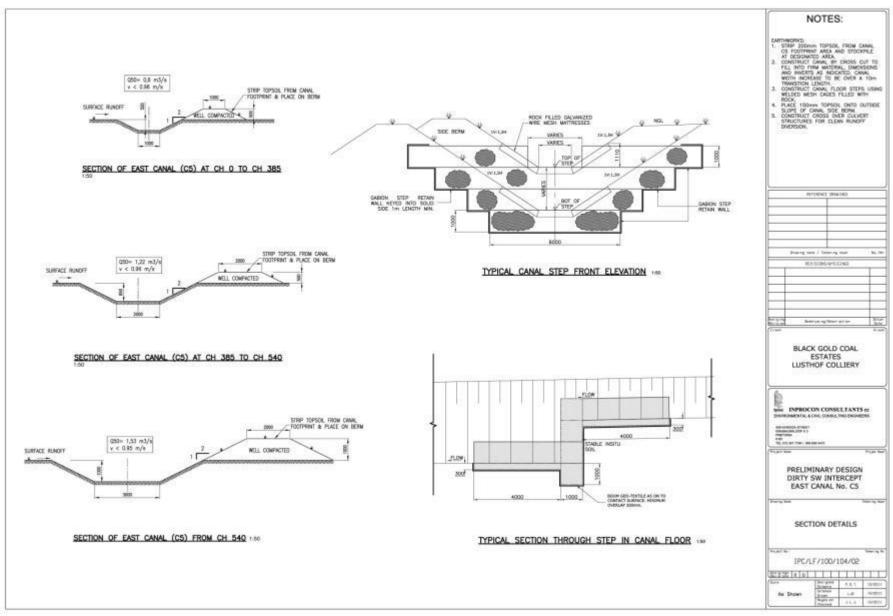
(b): Dirty Storm Water Intercept East Canal - Section Details.
